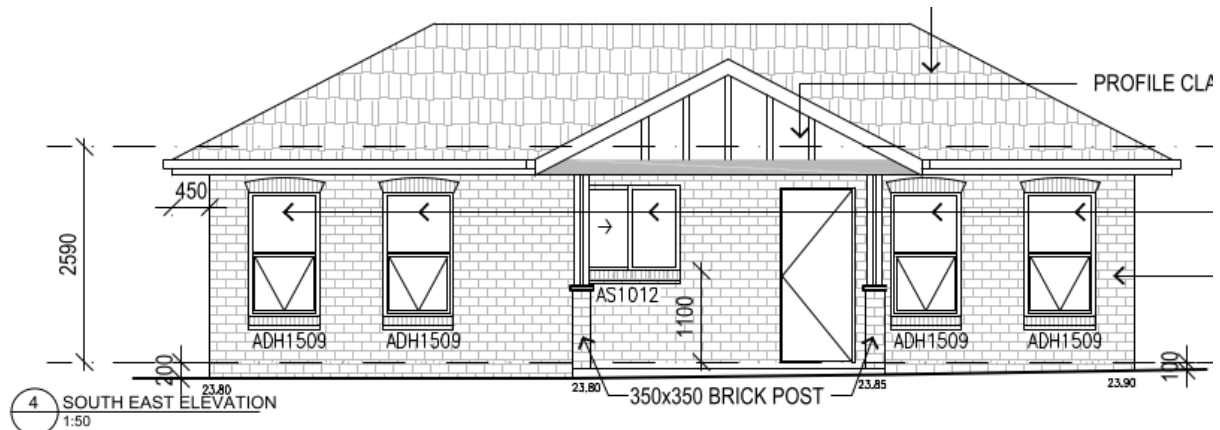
Extract of the approved south-east elevation of the secondary dwelling in the original DA
